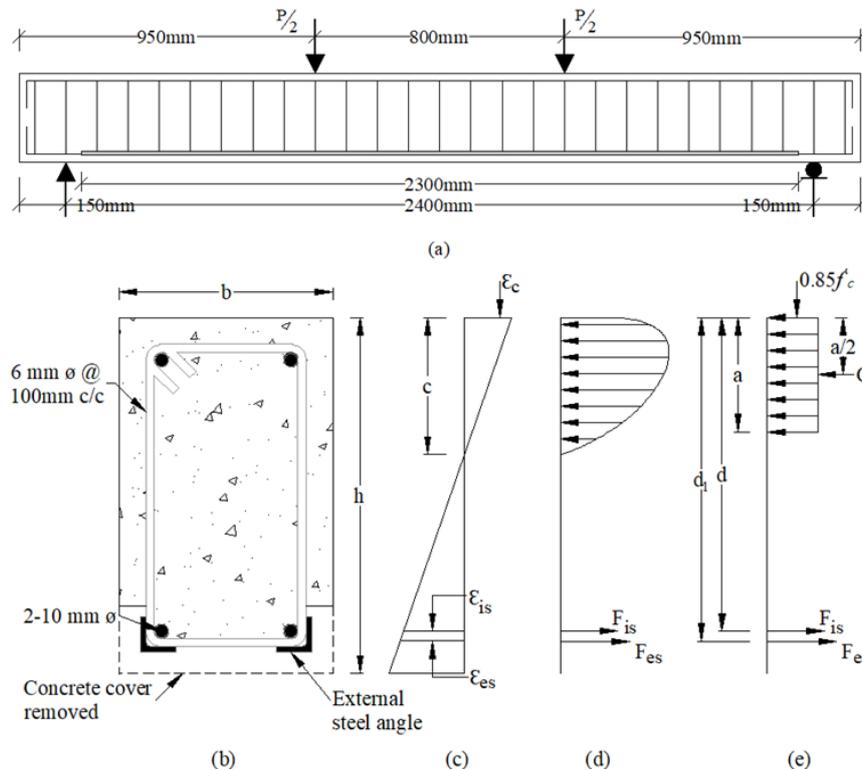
Schematic diagram of beams strengthened with external steel angles (a) long section (b) x-section (c) strain diagram (d) nonlinear stress diagram (e) rectangular stress block
